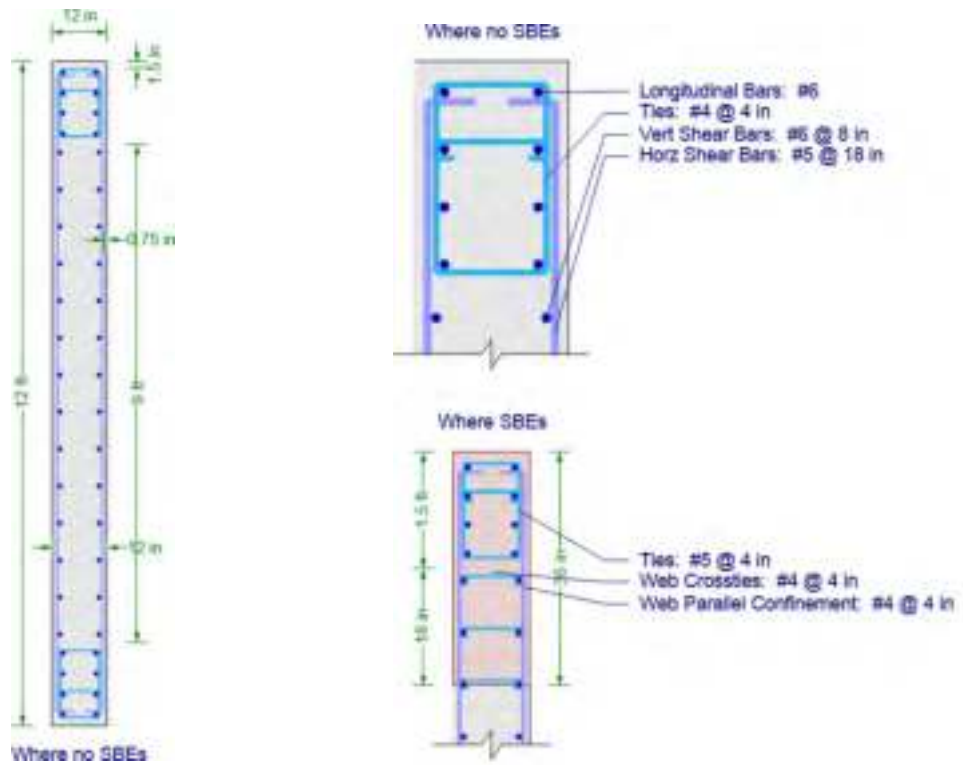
Building (B7-9S-L-S) Special RC Shear Reinforcement Details; Wall Section for Floors 1-3
